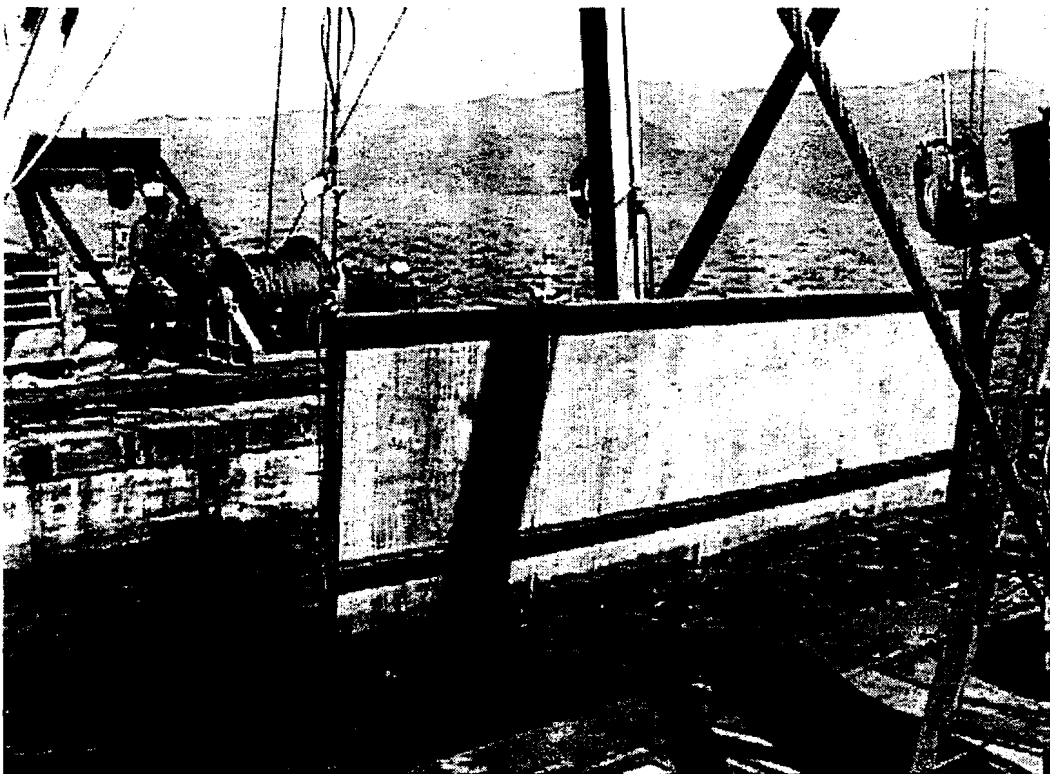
Hard Bottom Fully Unzipped and Ready to Lower to Lake Bottom
